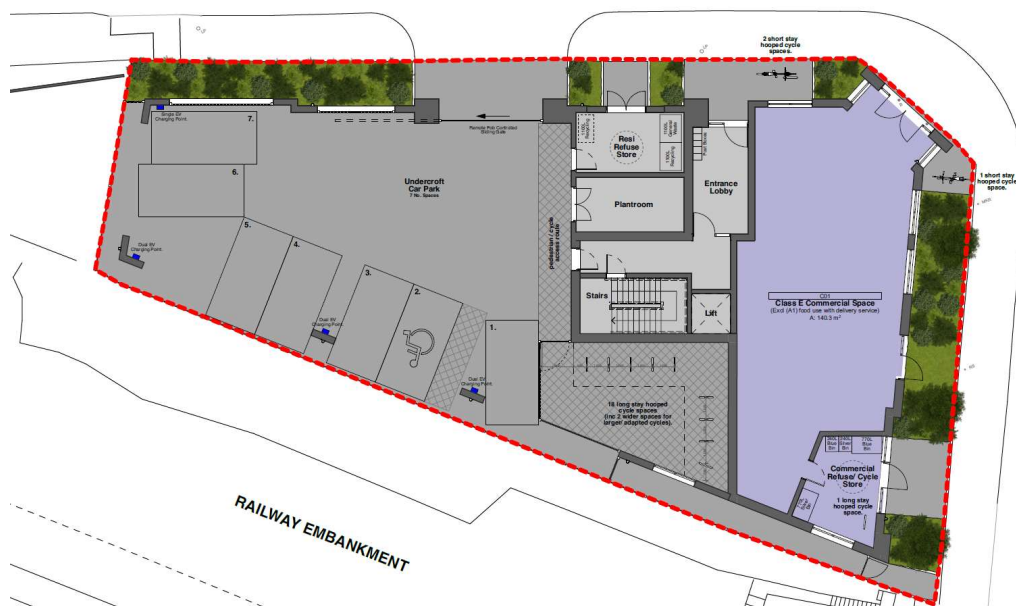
Proposed Site Layout (outline in 'red' below)
